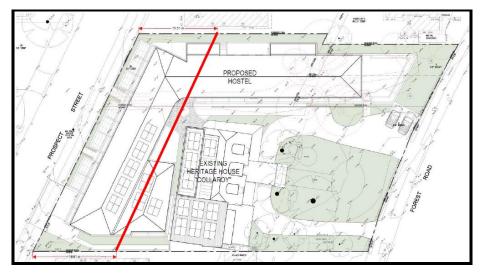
Three storey built form within the rear 25% of the site fronting Prospect Road (Source: Planning Ingenuity December 2020)
